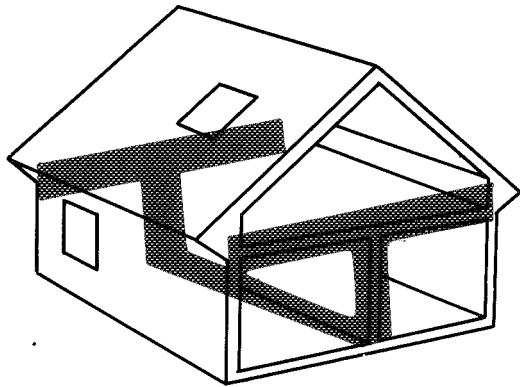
Gable wall — load-bearing internal wall, horizontal section.
